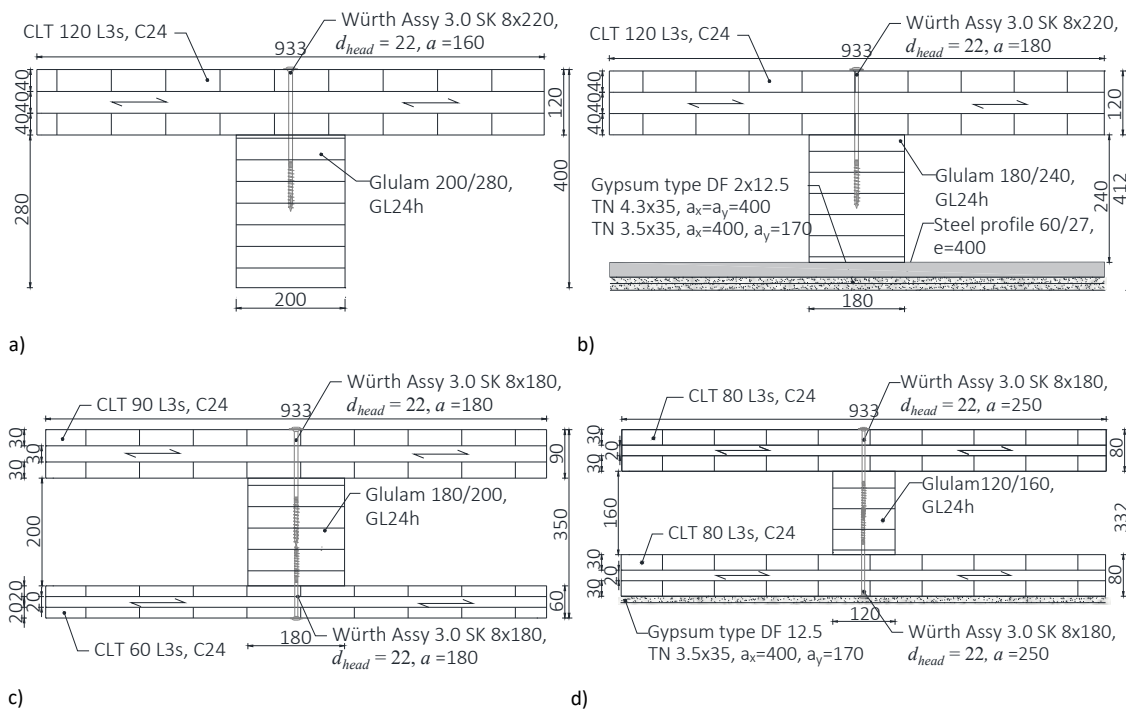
CLT rib panel cross-sections, in [mm]: a) T-section (A); b) T-section initially protected (B); c) Box-section (C); d) Box-section initially protected (D).
